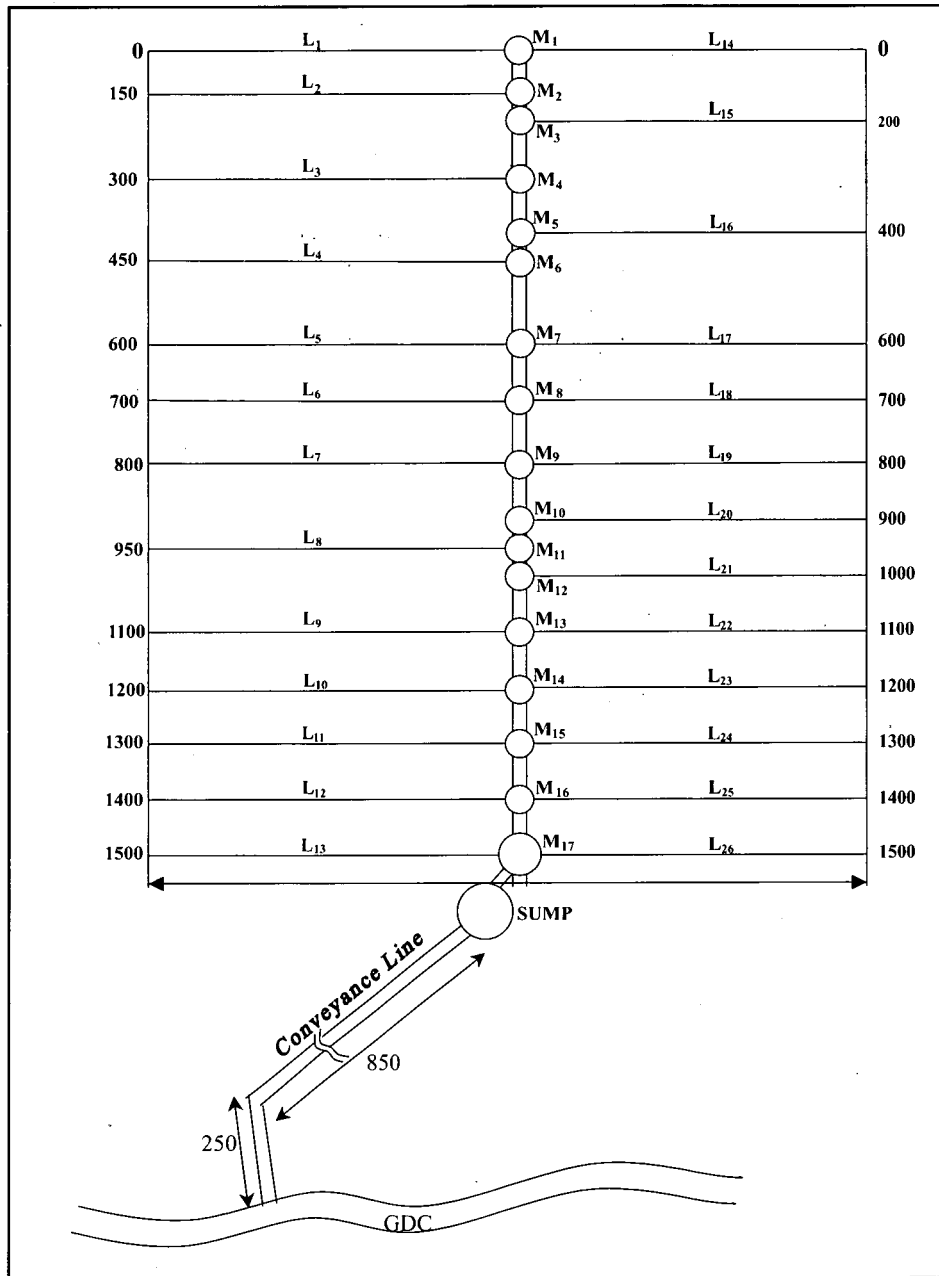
Layout of the subsurface drainage system at Lakhuwali
